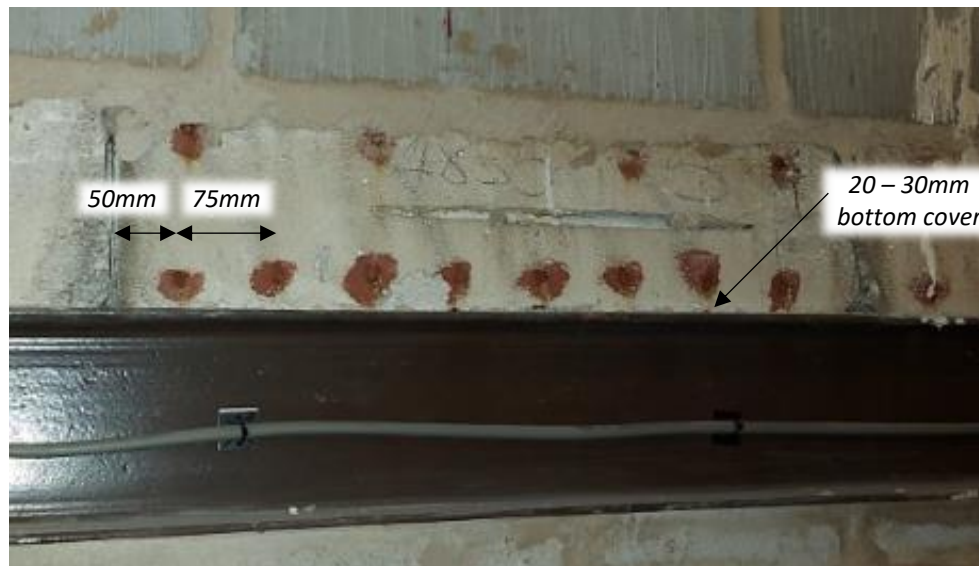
REINFORCEMENT ARRANGEMENT
